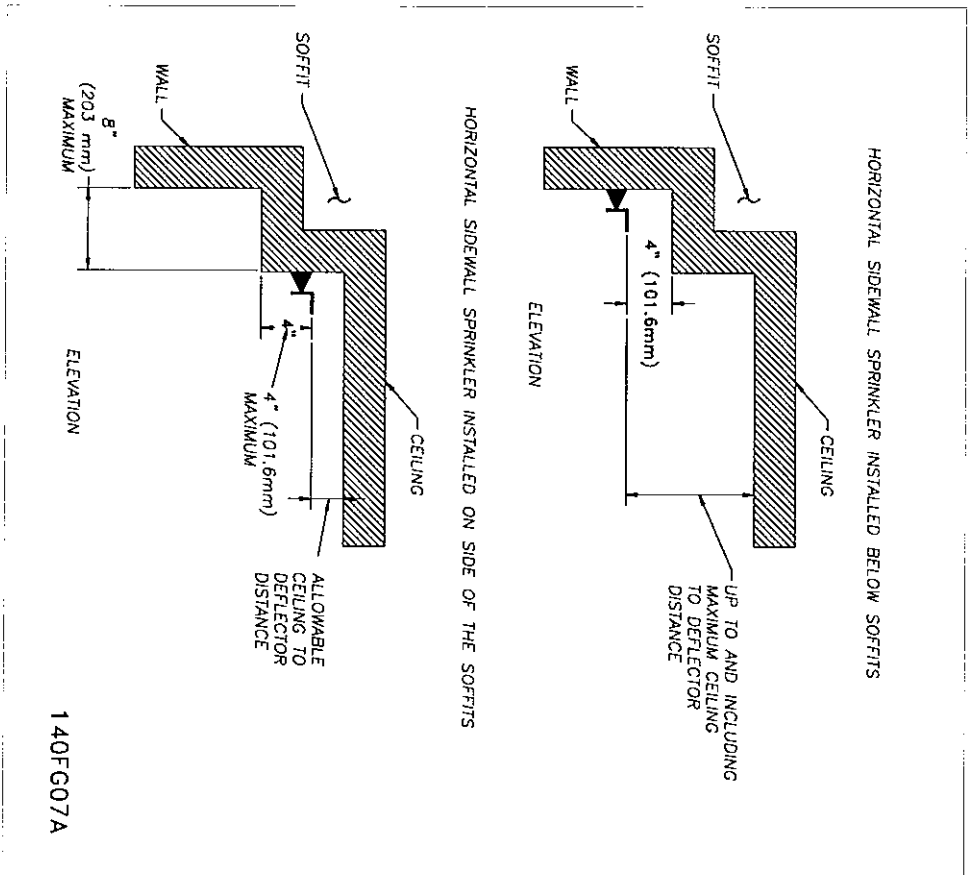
Positioning of HSW sprinklers relative to continuous obstructions along a wall.
